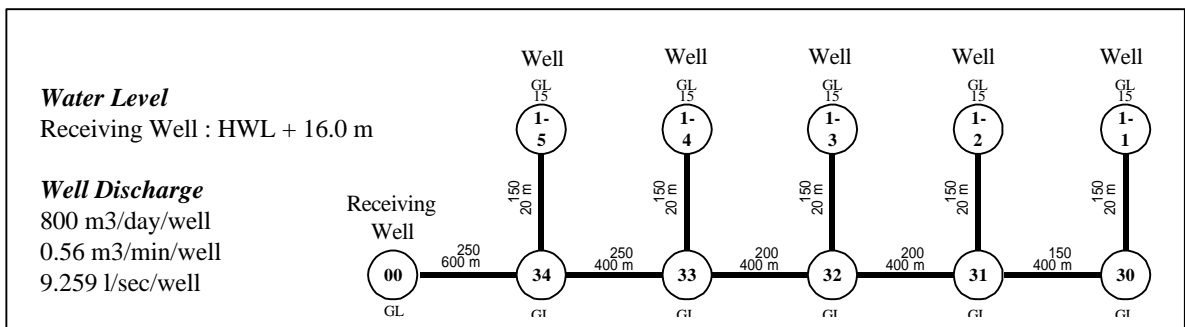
Schematic Plan of Well Connecting Pipe
